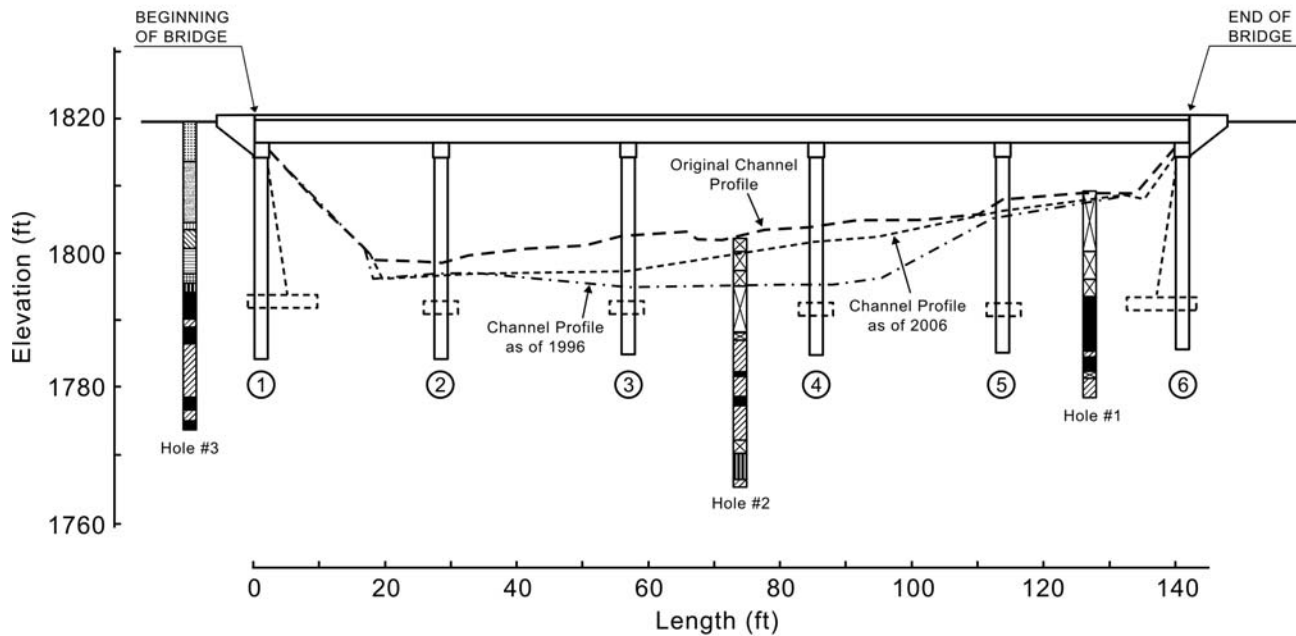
Case History No. 7 – Bridge Cross-Section.
